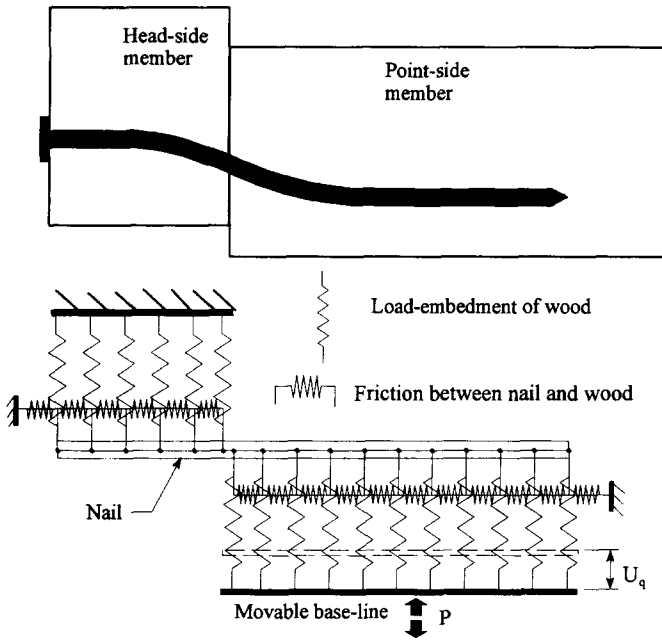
Assemblage of Finite Element for Nailed Wood Joint
